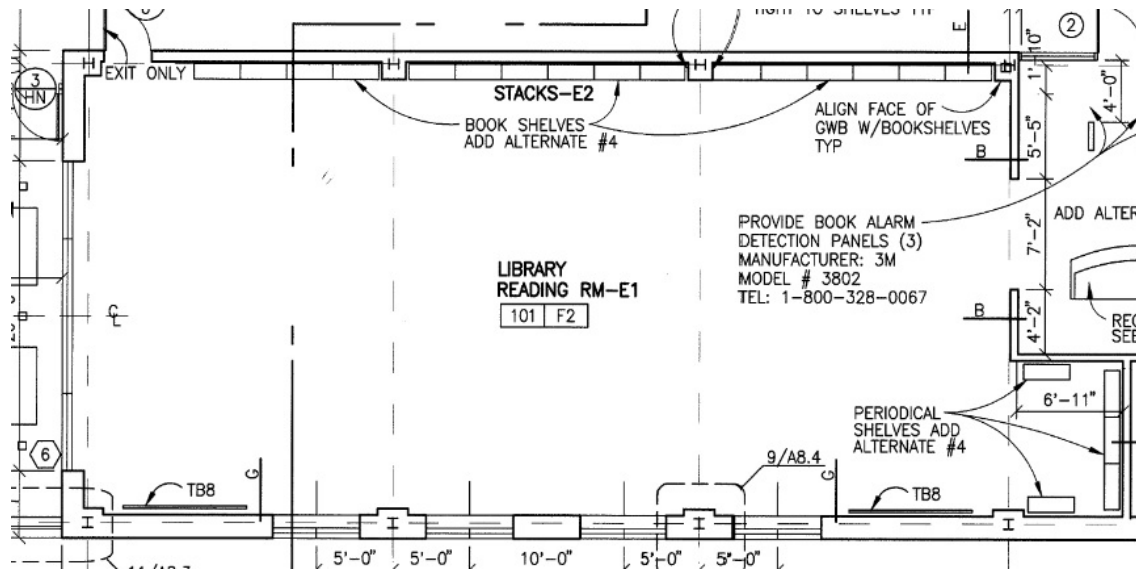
1st Floor Plan View of Schaefer Engineering Library
